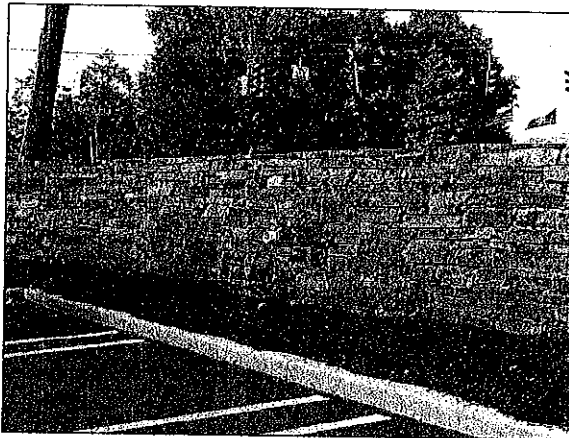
A good application of dry stone wall that serves as a retaining wall as well as a decorative feature for a parking area below street grade. The stone is quarry cut.
